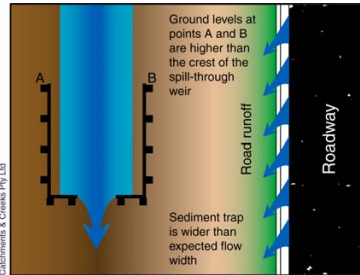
When placed in a narrow table drain, the sediment trap normally needs to be installed as a narrow U-shape trap
